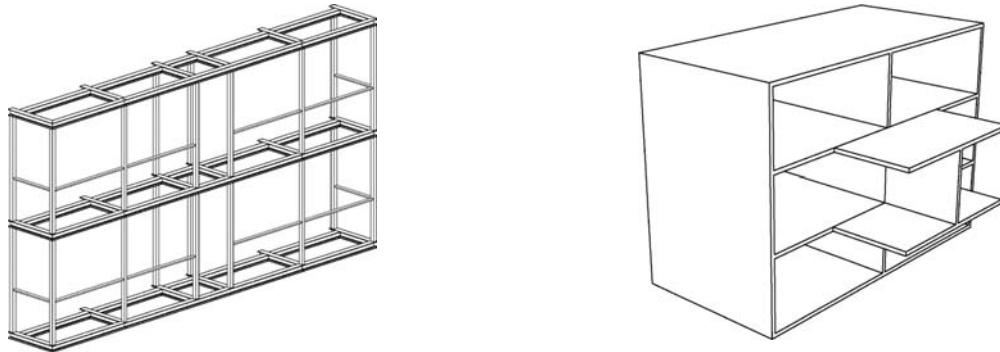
Steel construction for four winter gardens (left); Principle of a concrete extension (right)
